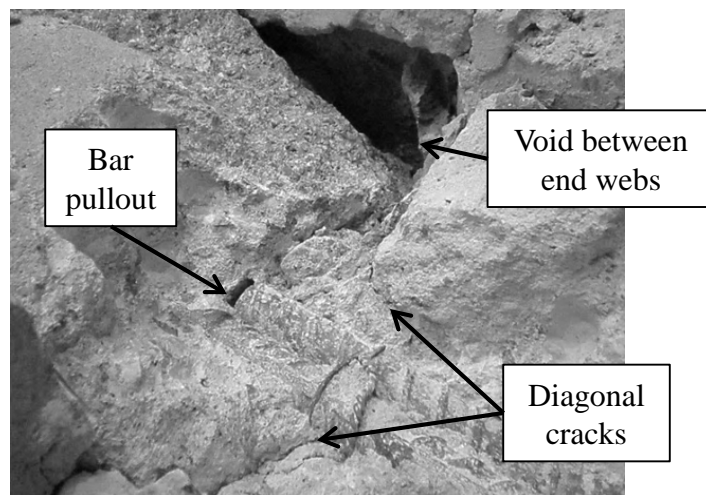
Internal damage and crack propagation observed in specimens with contact lap splices.
